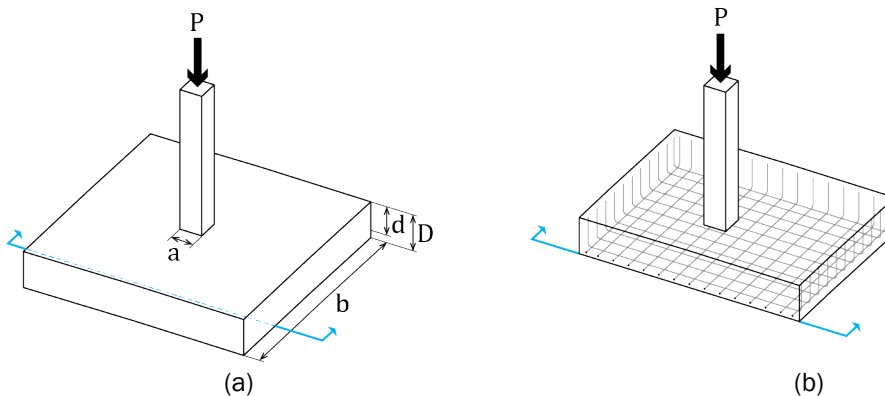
(a) Dimensions of spread footing, and (b) section of spread footing
